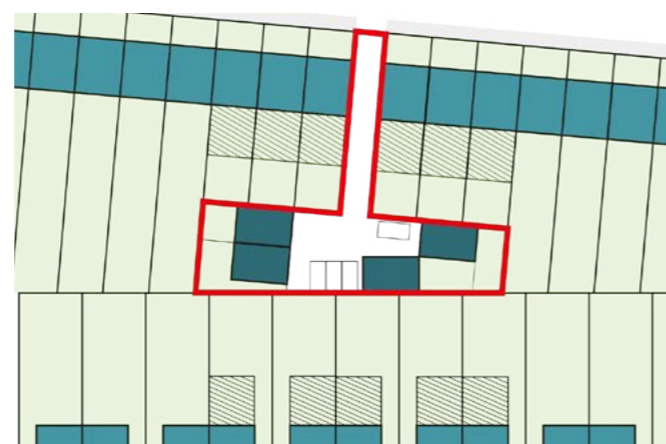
A developed, off-street backland site that provides four new homes that are designed to be subservient to the existing street-facing development.
